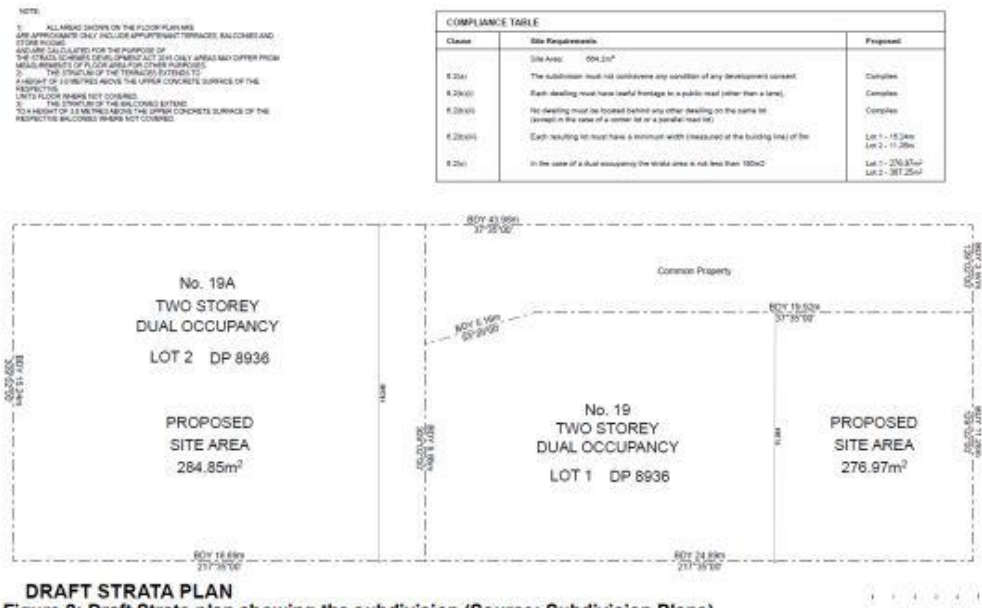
Draft Strata plan showing the subdivision (Source: Subdivision Plans)
